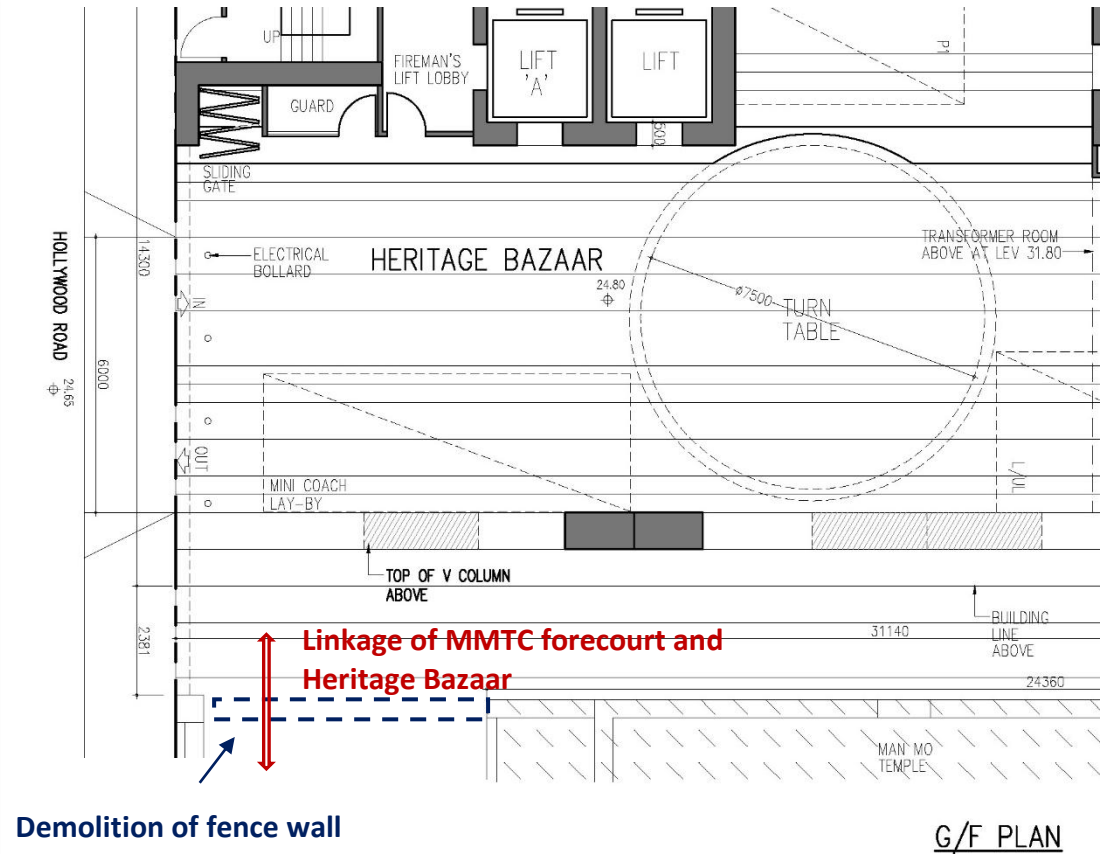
Fence wall now separating MMTC and the Project Site will be demolished
